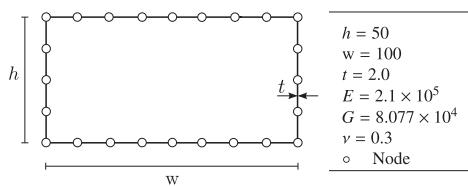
Geometry and parameter values of a rectangular hollow section column.
